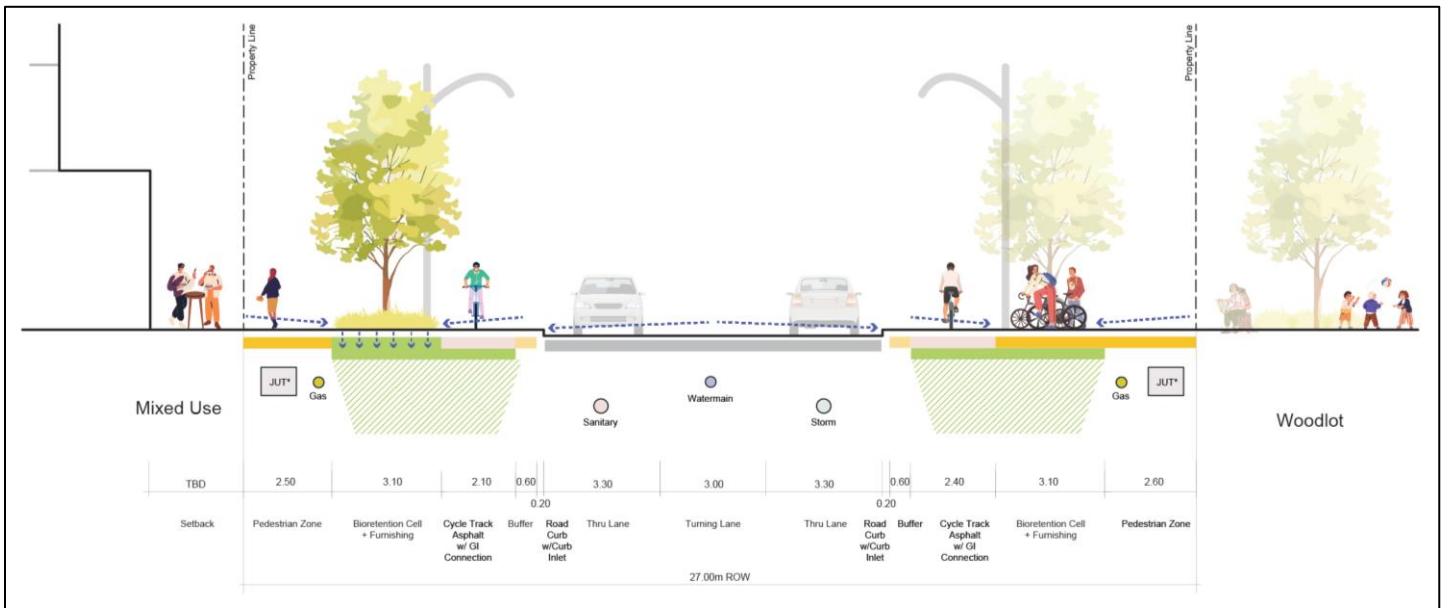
Northern Street (Keele Street to Sheppard Avenue West) Cross-Section – Option 3
